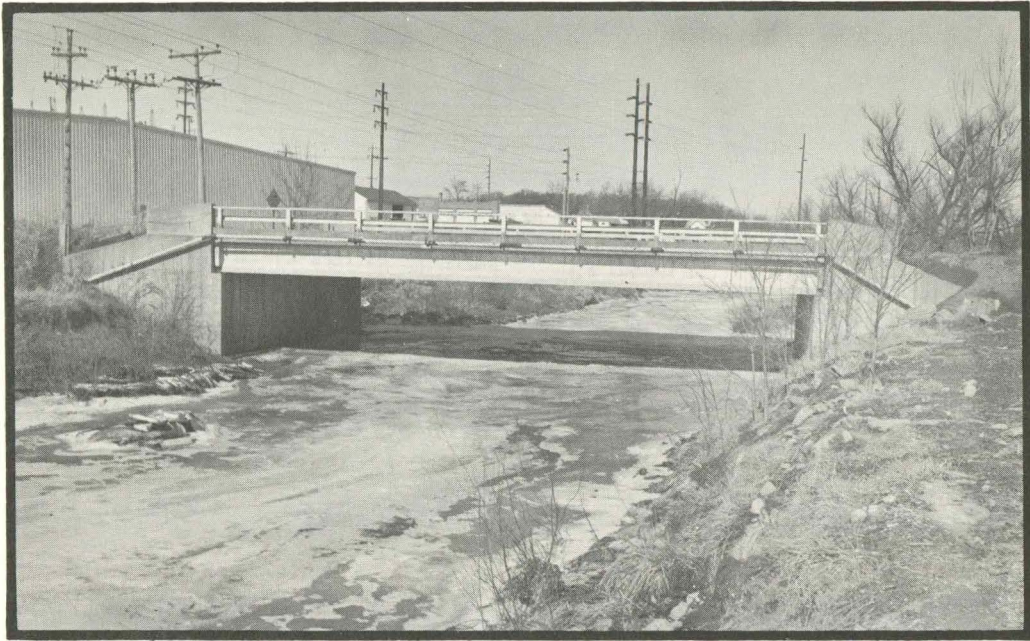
Looking upstream at the Clay Street bridge over Mad Creek at Muscatine, Iowa, Sta. 75+00.
